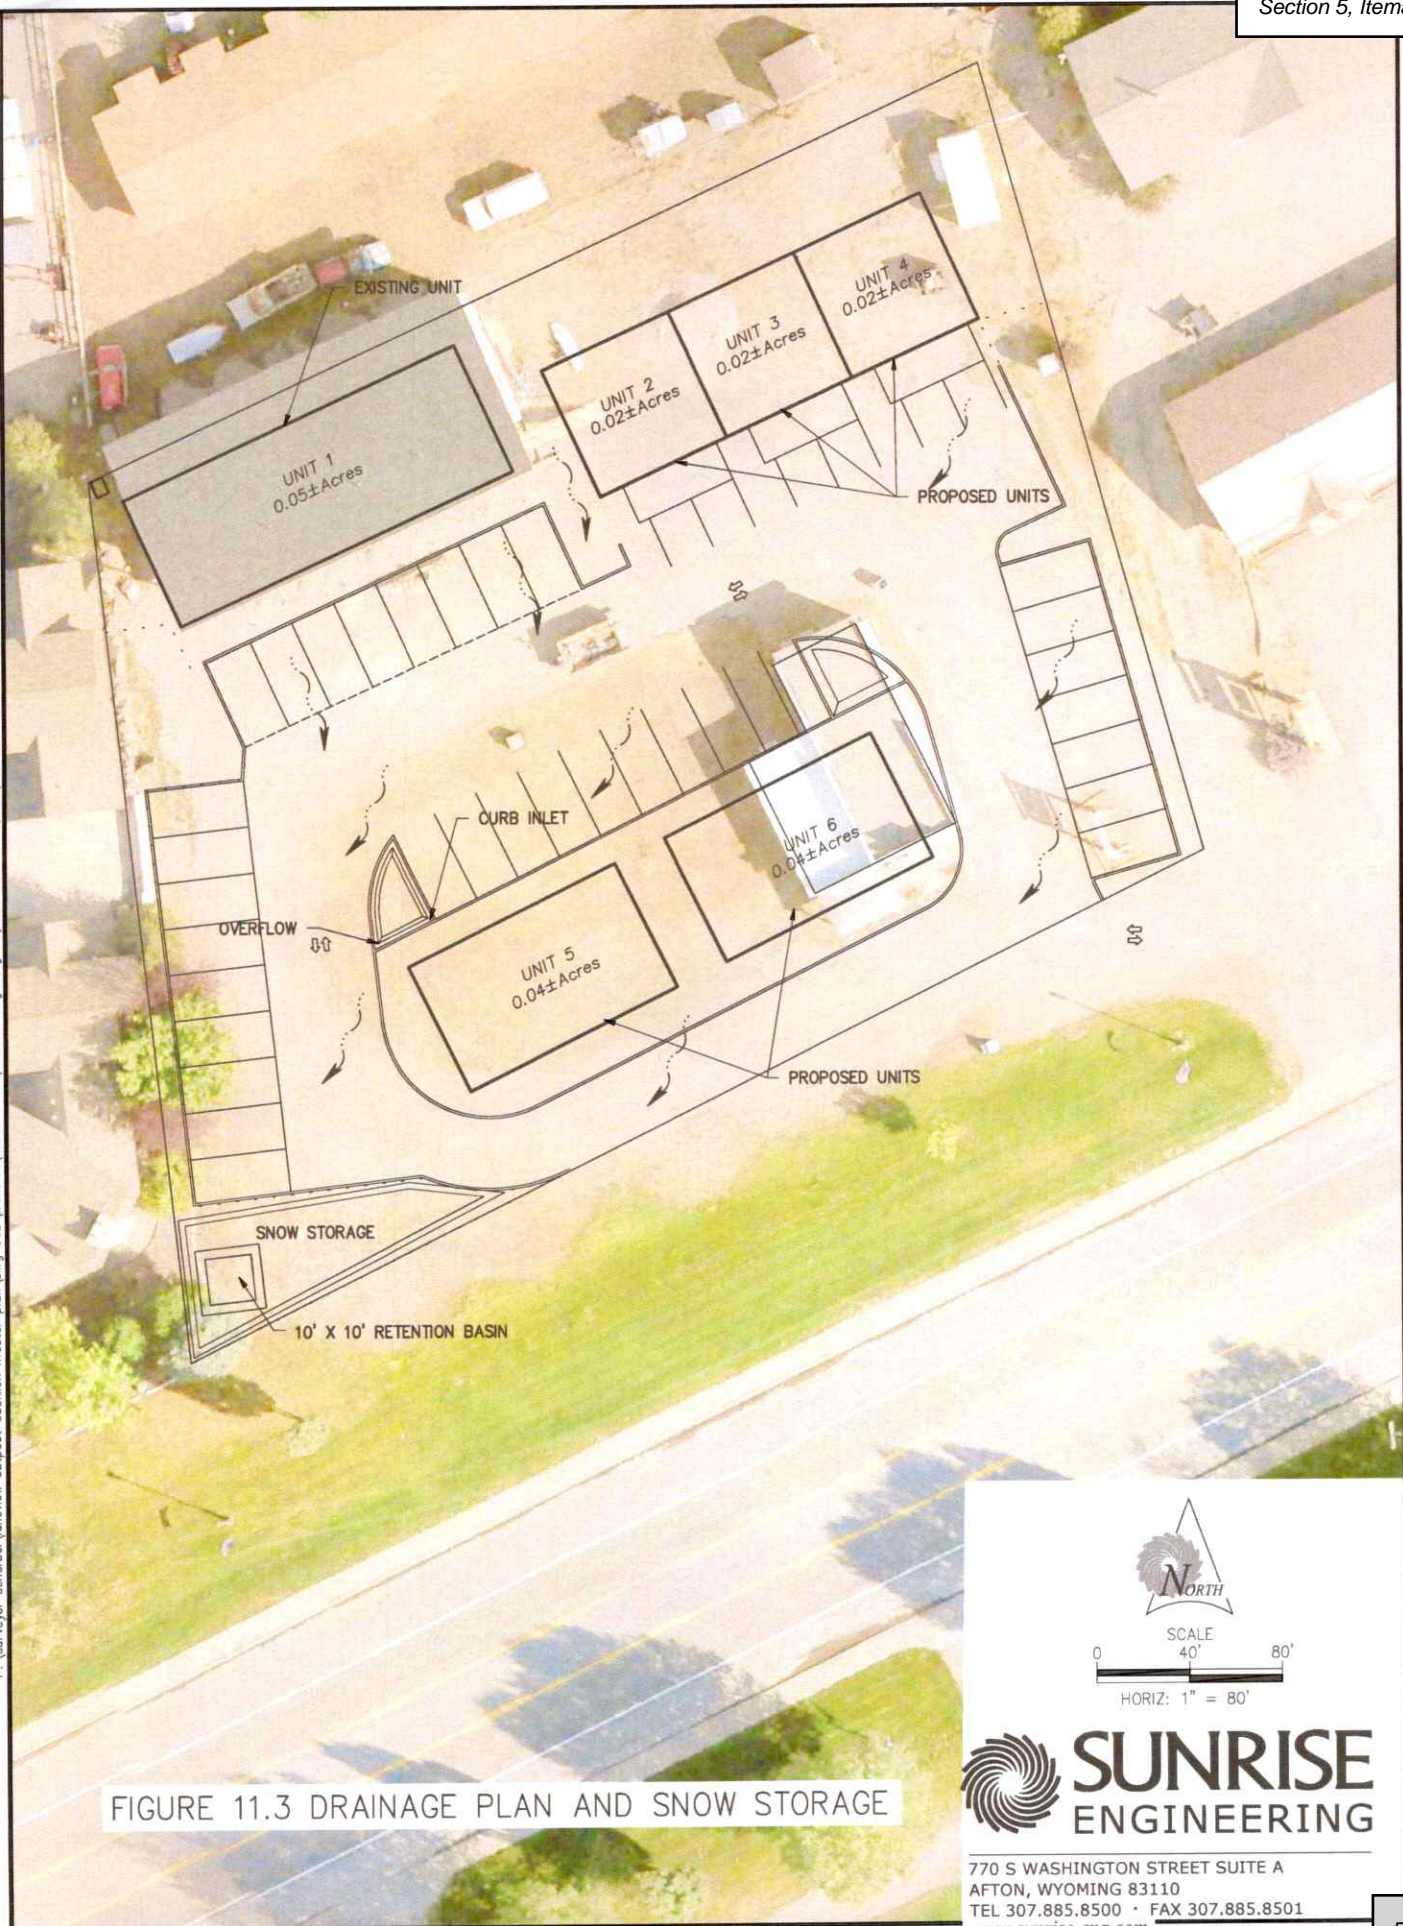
DRAINAGE PLAN AND SNOW STORAGE
